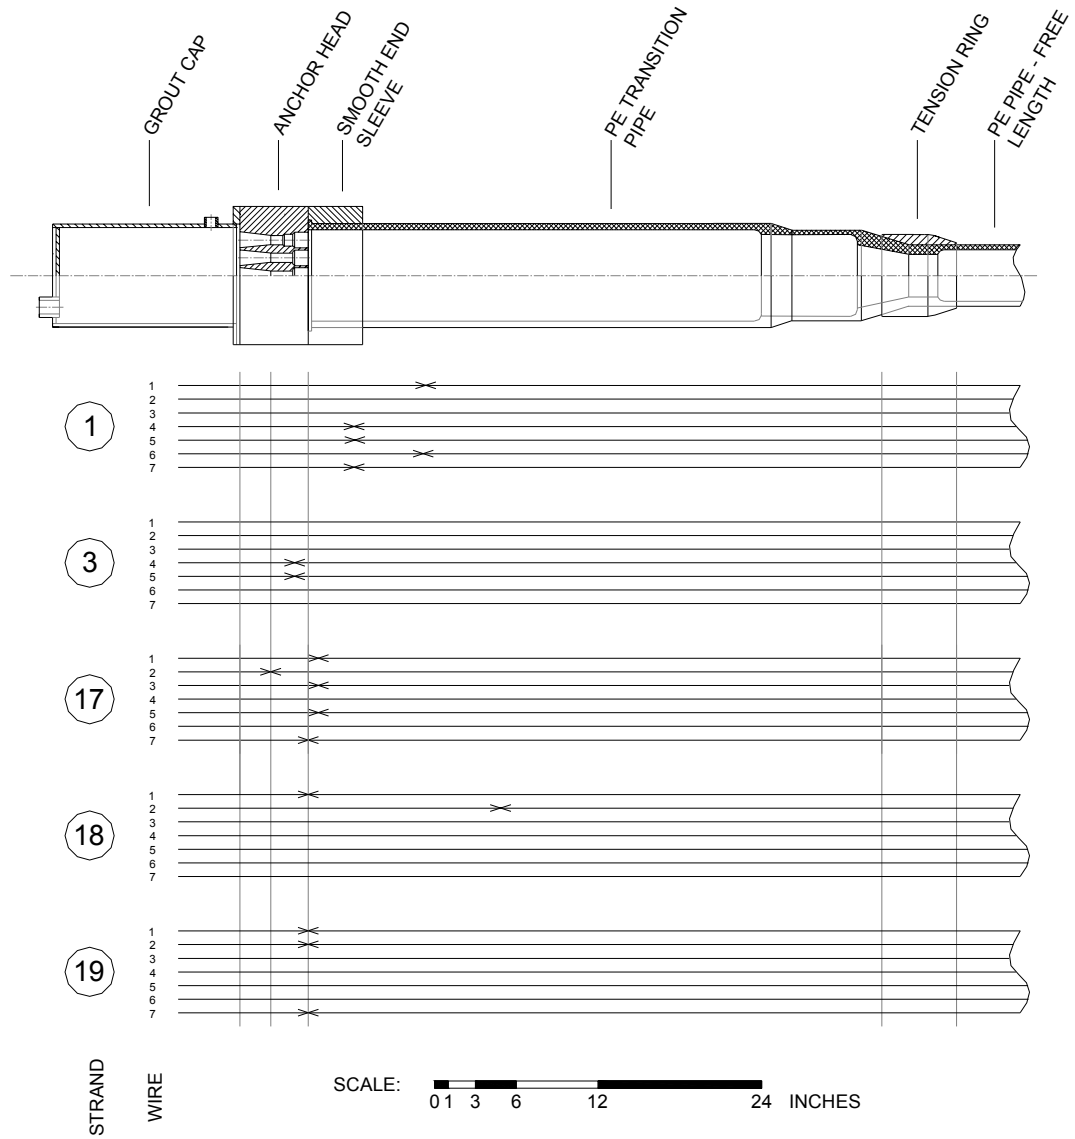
Location of breaks near the deck anchorage - Specimen 7
